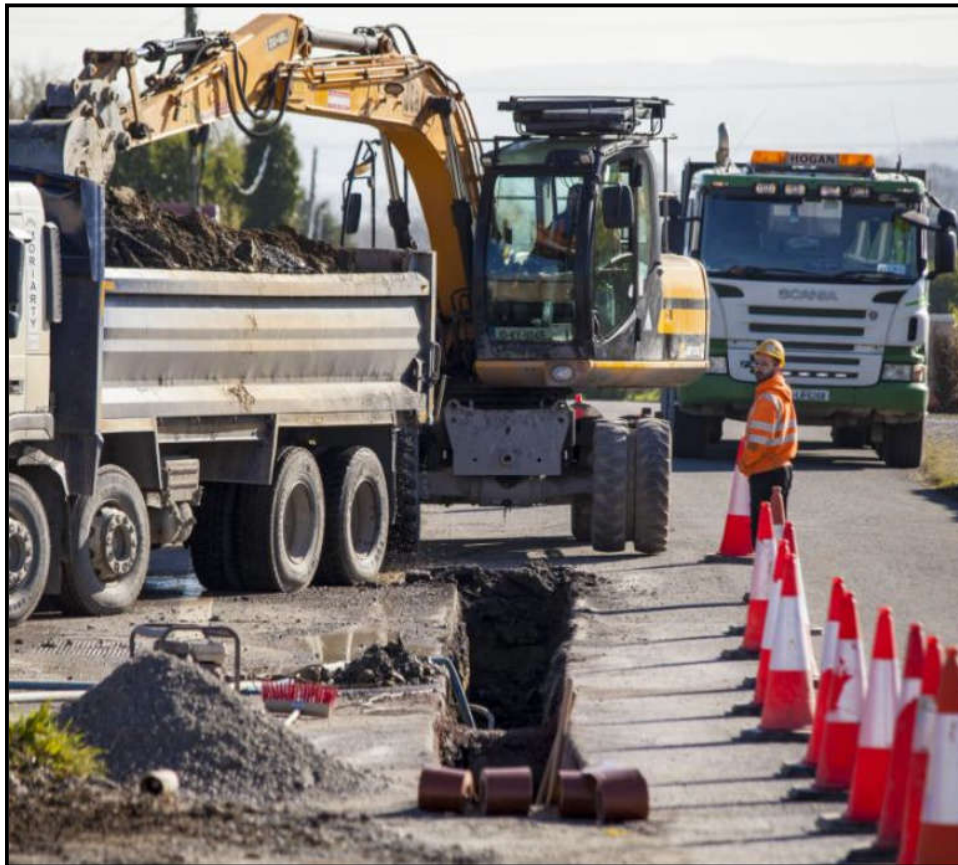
Grid Route example of the proposed excavation works for a cable trench
